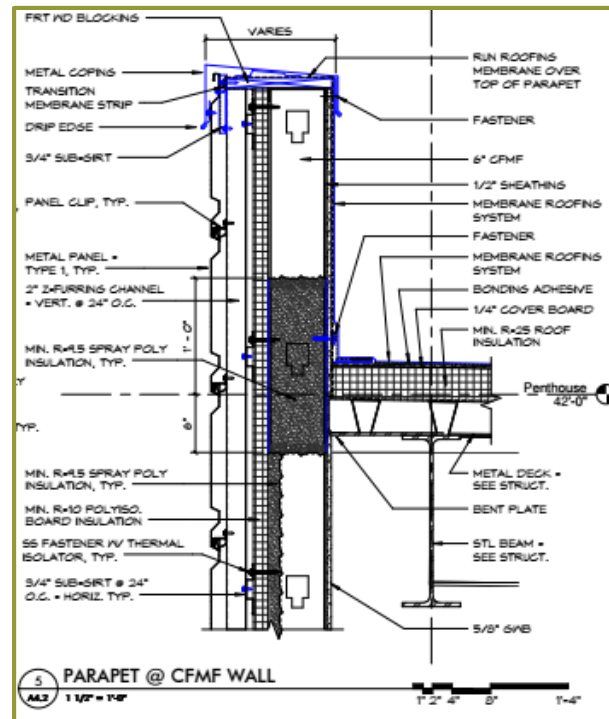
DETAIL 5 ON A5.2: TYPICAL WALL SECTION COURTESY OF ALEXANDER
